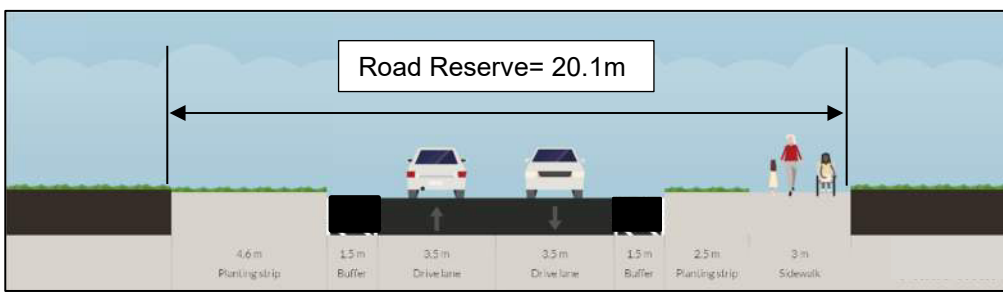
Proposed Cross Section for Lamb Street and Cambridge Road
